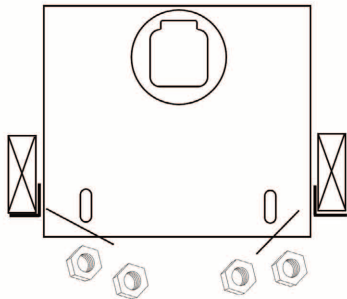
MODIFIED EXISTING CONSTRUCTION
